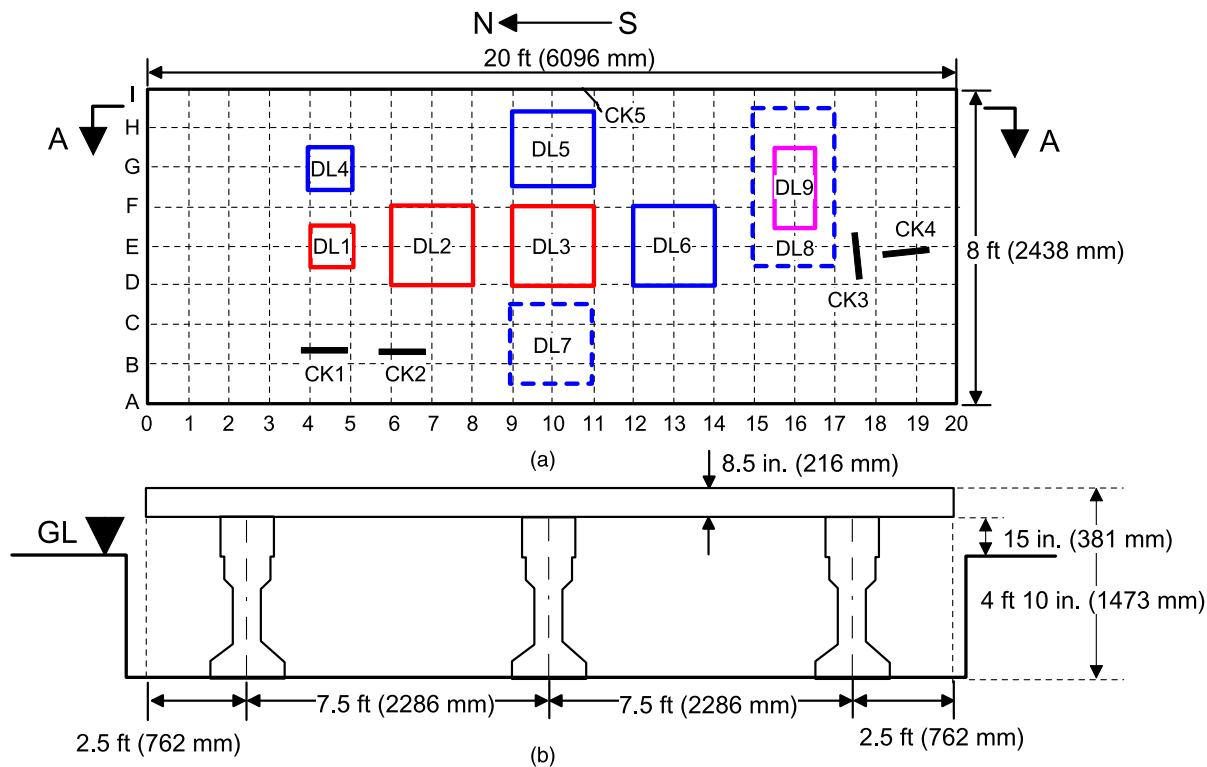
RC bridge deck specimen: (a) plan view of the specimen showing the location of the defects and the test grid designation (detailed information is shown in Table 1); (b) section view (A-A) of the specimen [shallow delaminations are indicated by solid lines and deep delaminations are indicated by dashed lines; the nominal grid spacing is 0.305 m (1 ft) in both directions]
